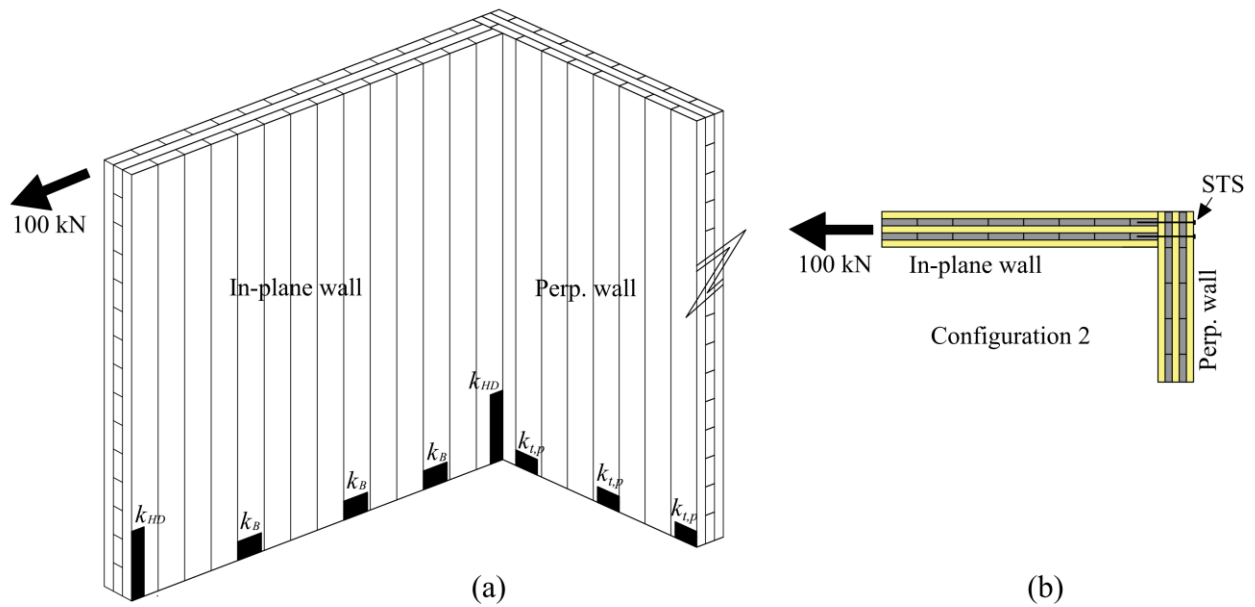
(a) In-plane wall-to-perp. wall's configuration 2 and (b) connections between in-plane wall-to-perp. wall in configuration 2
